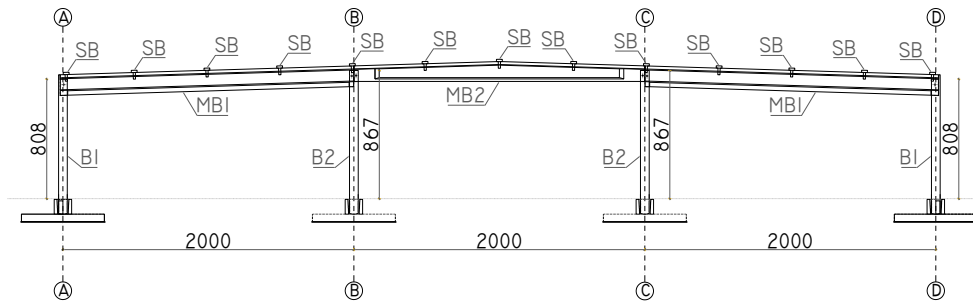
Transversal cross-section of the industrial hall prototype structure.
